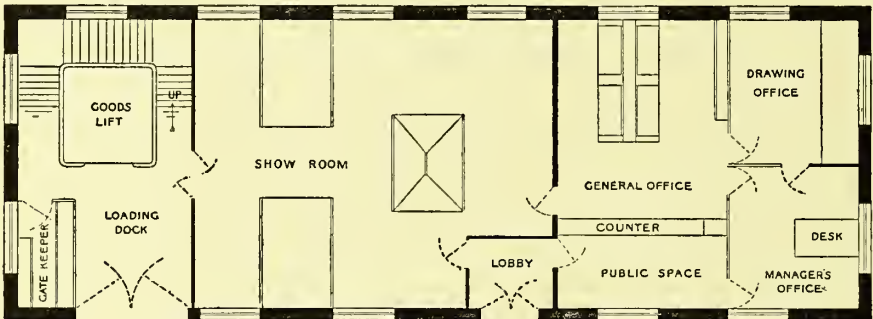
Ground-floor Plan, showing Offices, Show Room, and Loading Dock
